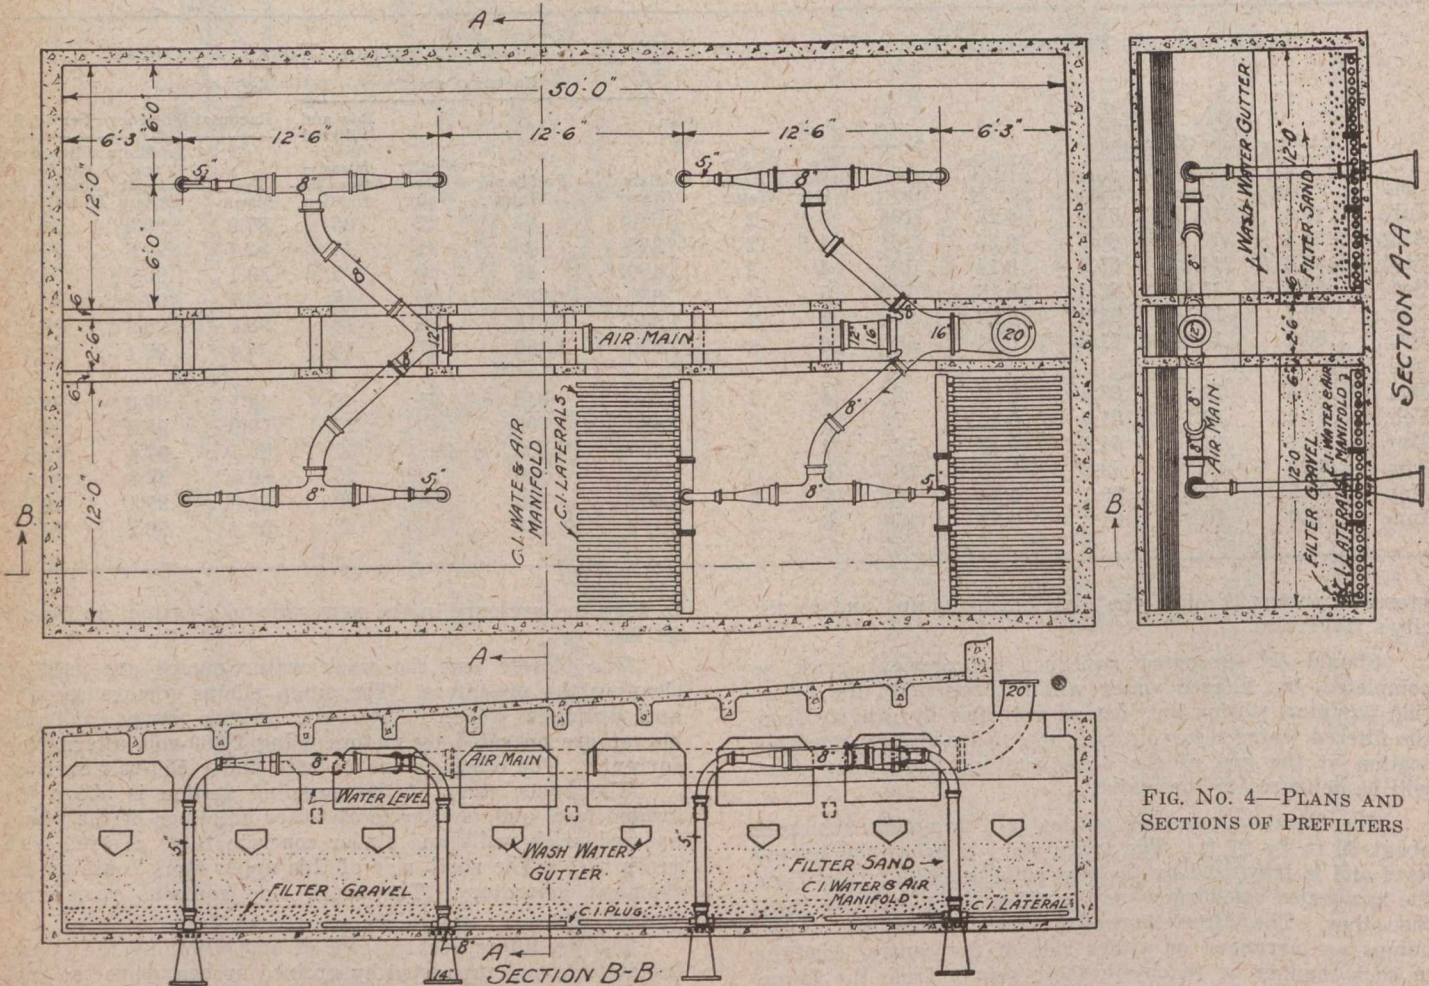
PLANS AND SECTIONS OF PREFILTERS
